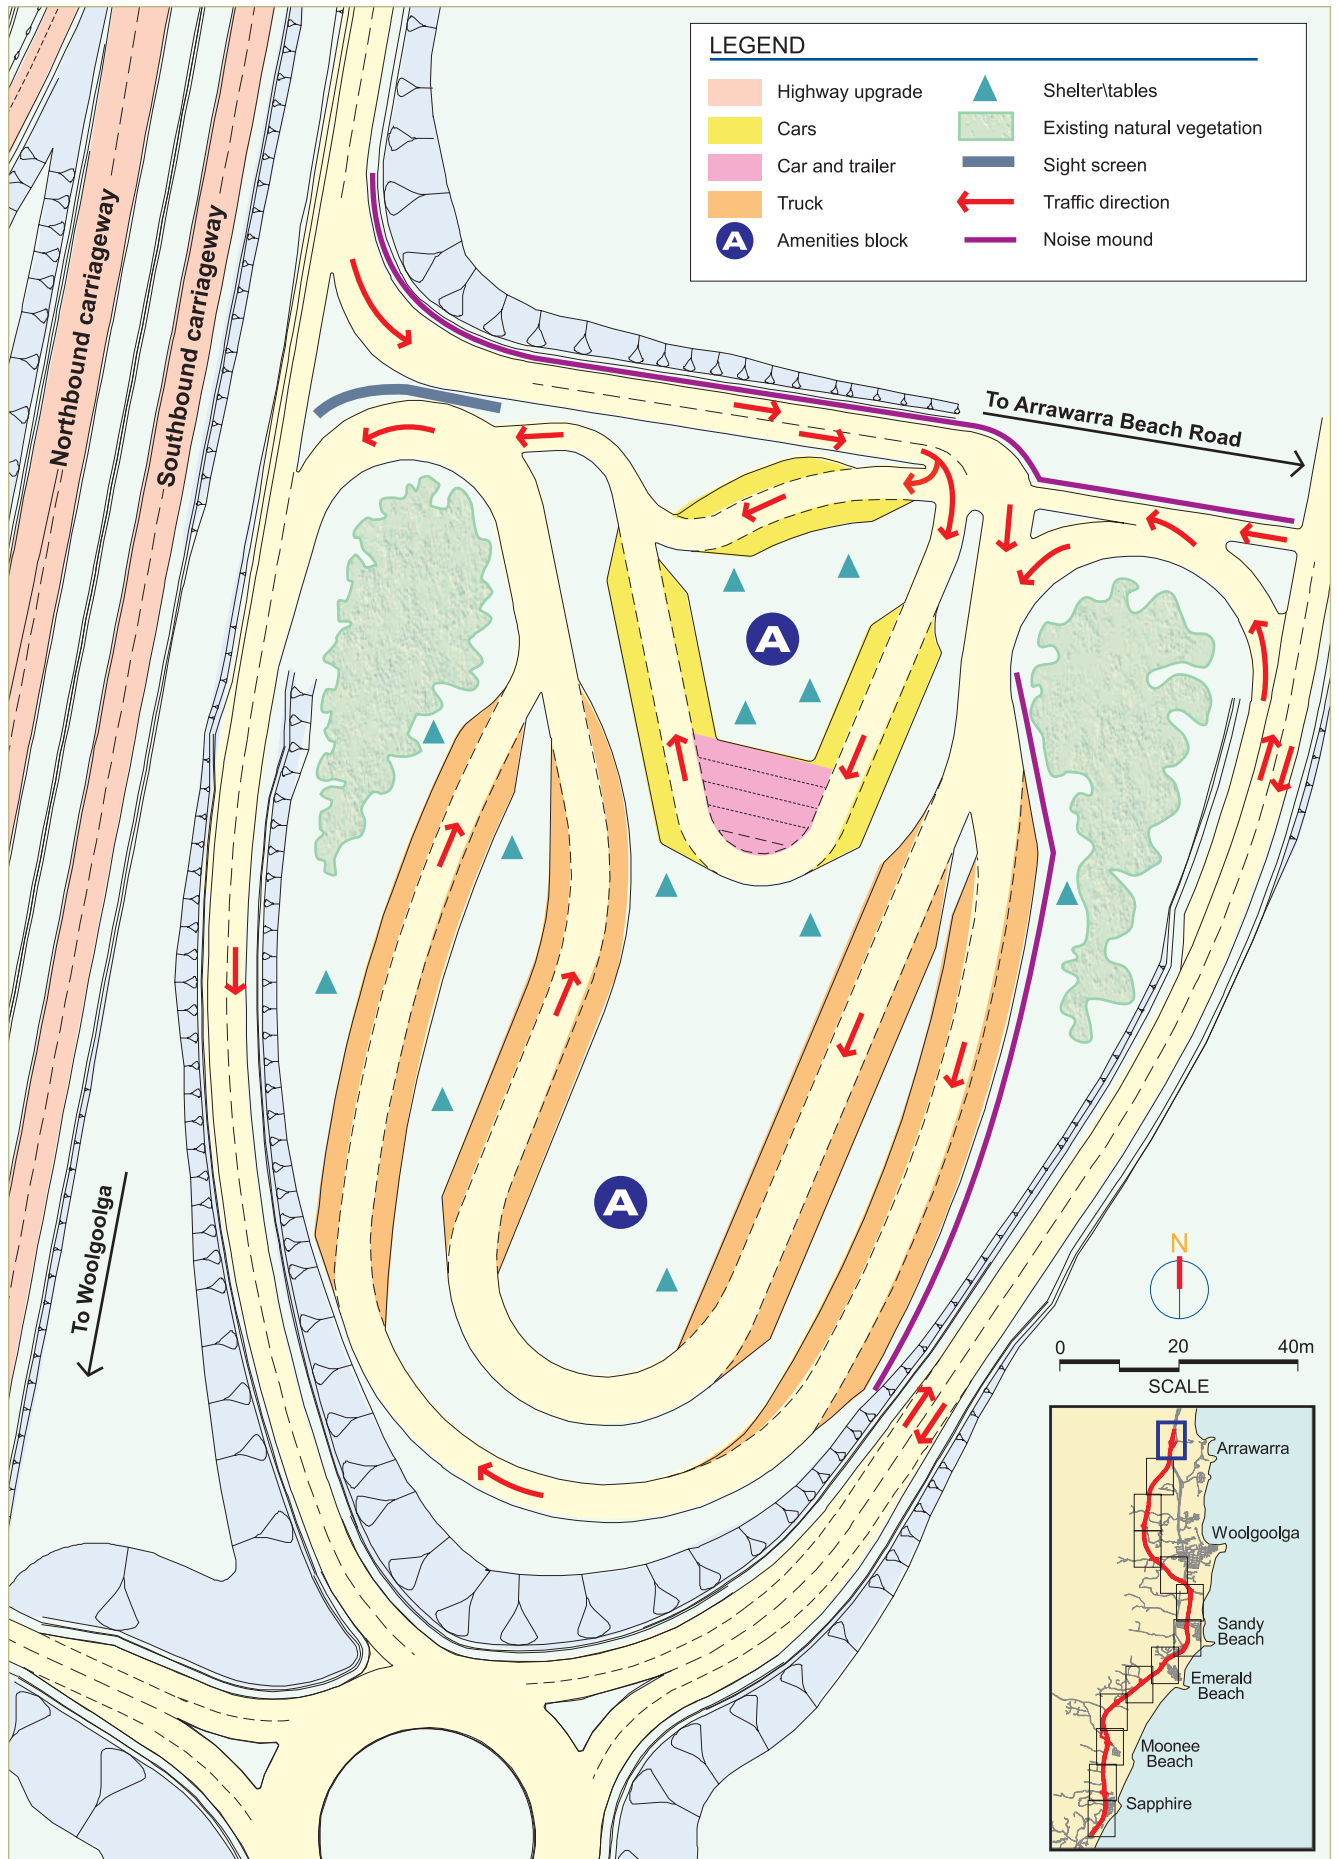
PROPOSED ARRWARRA REST AREA
